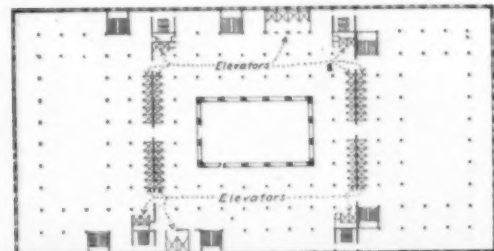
Department store floor plan showing present arrangement of fire walls, elevators and stairs.
